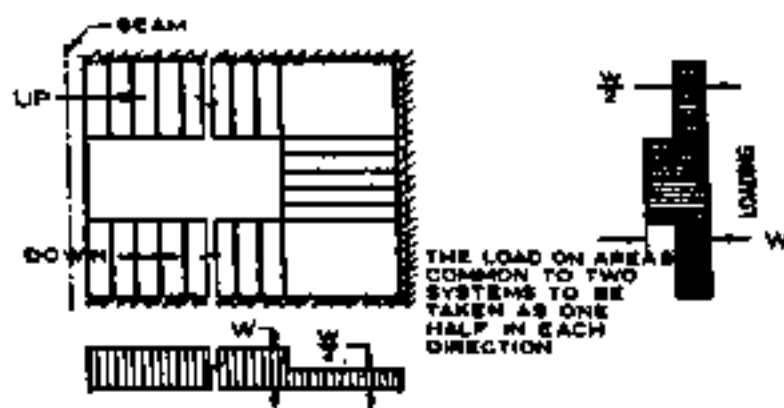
LOADING ON STAIRS WITH OPEN WELLS
